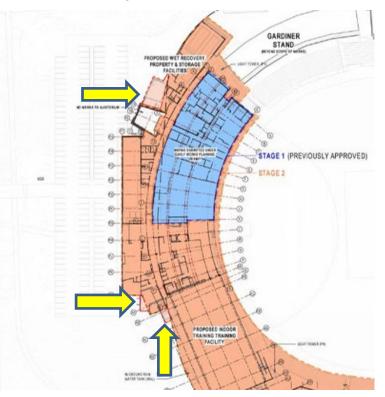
Existing lease line and proposed building footprint. Incursions beyond lease line marked by yellow arrows (source: application plans prepared by Populous)
